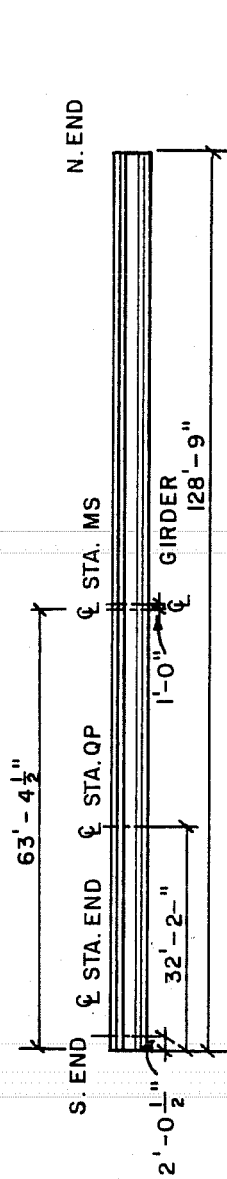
is the layout of a typical casting of instrumented girders along with elevation views of the specimens as cast in both positions 1 and 2. The elevation views show the
